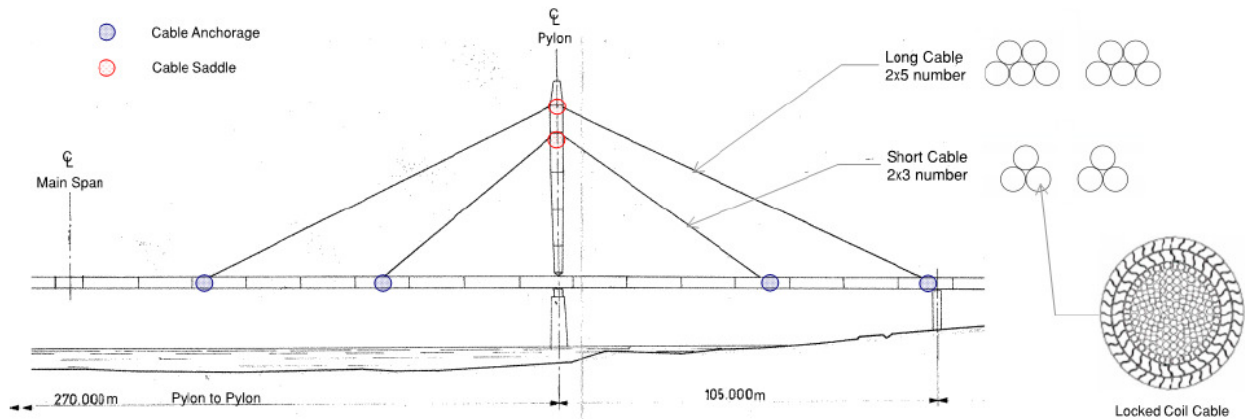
HALF ELEVATION OF MAIN SPAN AT EWIIJK AND CABLE DETAILS (LAVERY ET AL., 2013).
